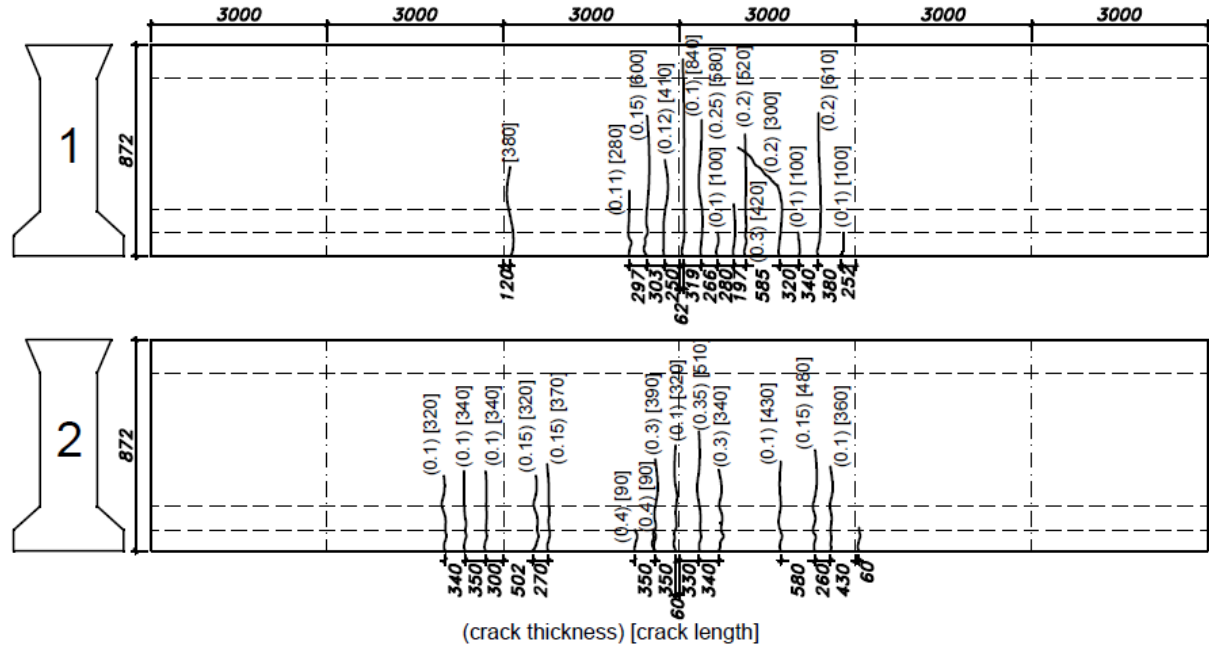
Cracking determined through visual inspection for girders 1 (top) and 2 (bottom). Dimensions in mm [1 mm = 0.0394 in.]
